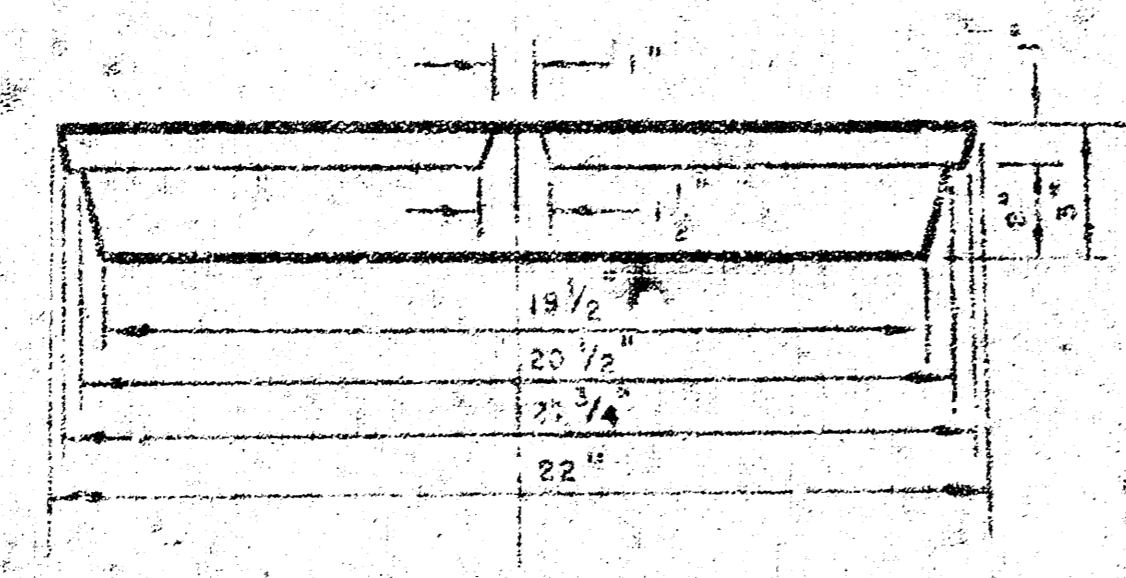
DETAIL OF DROP STACK FOR EXISTING MANHOLES IN GROUND WATER
